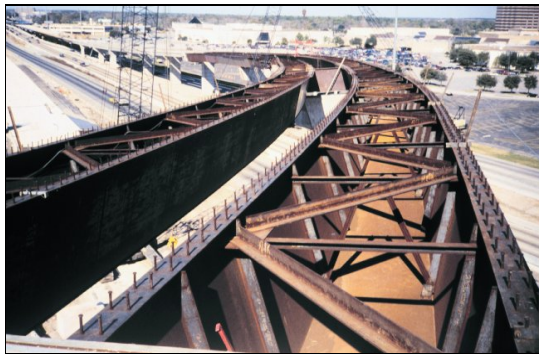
Cross-Section of a Box Girder Bridge System (Gilchrist, 1997)
